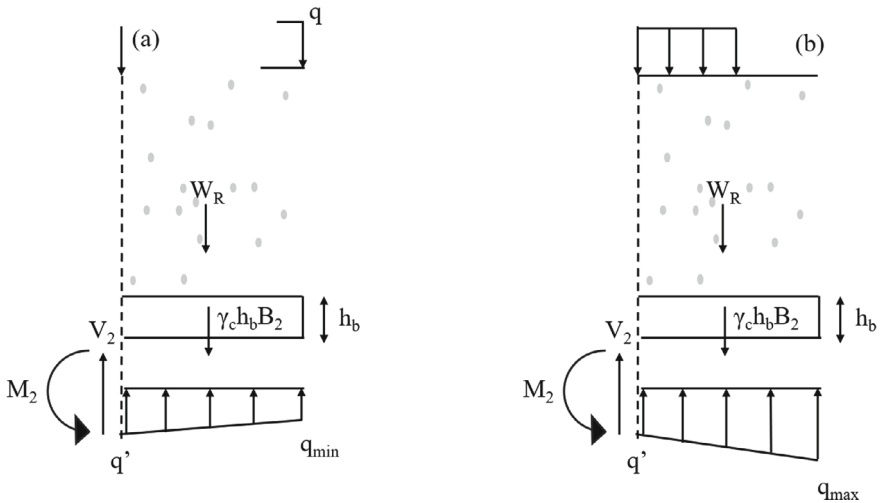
Forces acting on the heel and cross-sectional effects on the cantilever wall surface
